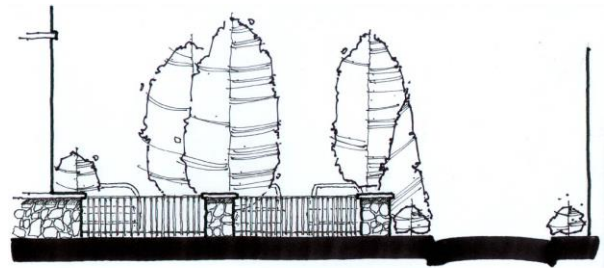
Any parking on the sides of buildings near the public street shall be screened with a decorative fence or wall or landscape screen extended at the building line to continue the street wall formed by the building line.
